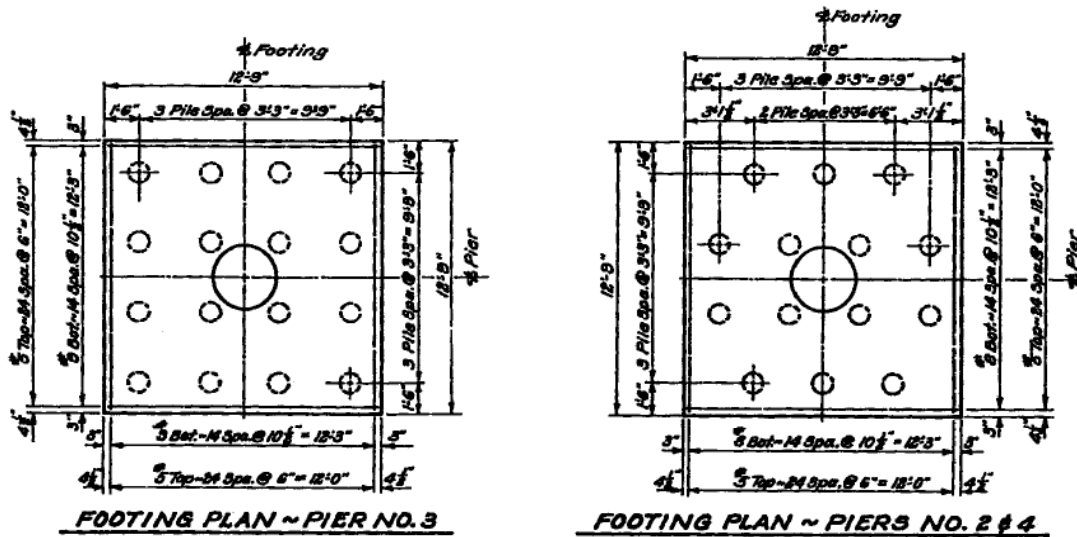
Column Footing Plans for Bridge 5/826
